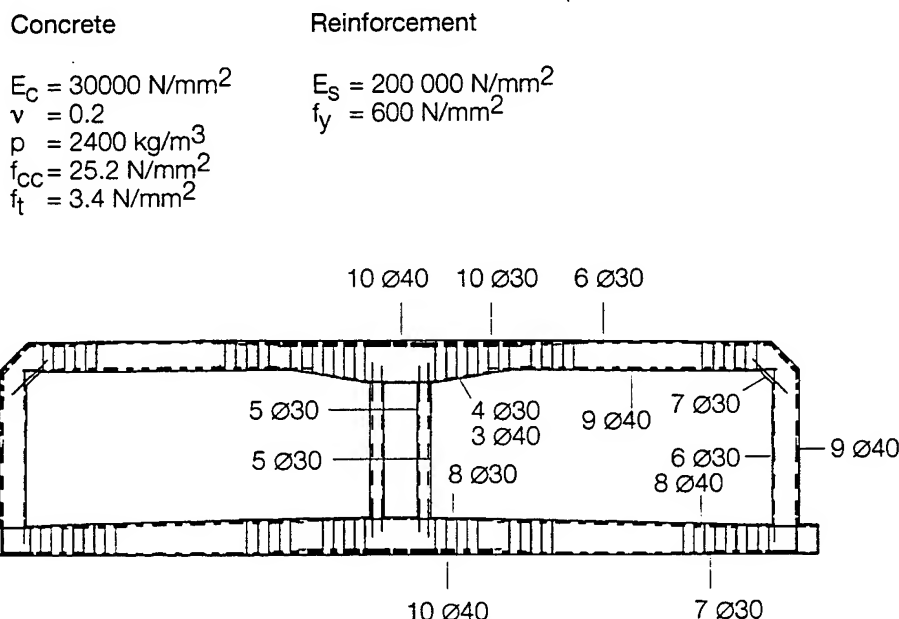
Reinforcement layout (1.5 m wide section) and material properties
